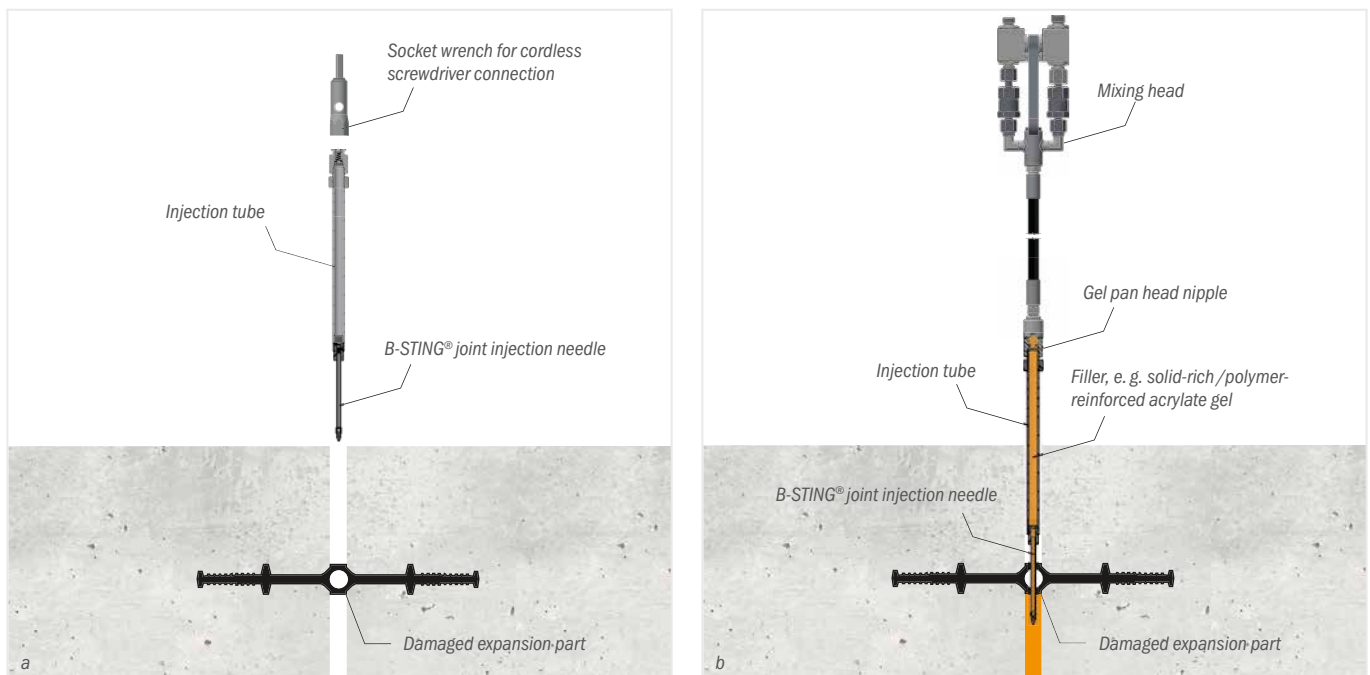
Screwing in the B-STING® joint injection needle through the seal with a cordless screwdriver (a) and subsequent injection of the motion joint (b)
